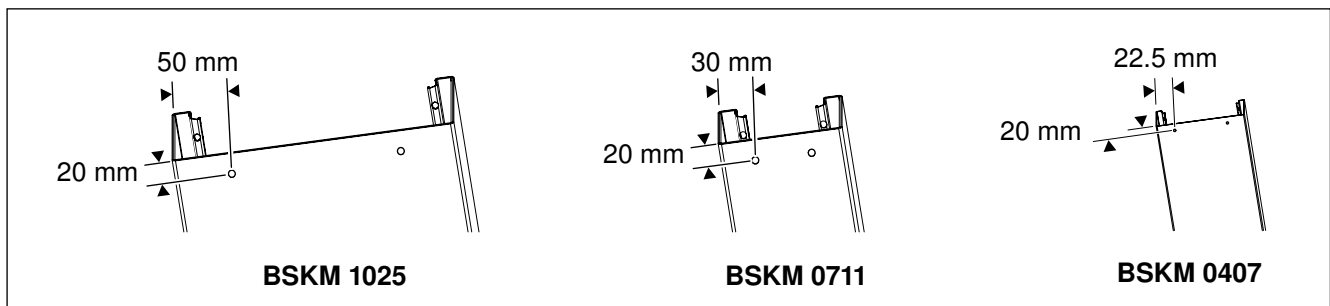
Spacing of the duct fastening holes (Ø 6 mm)
